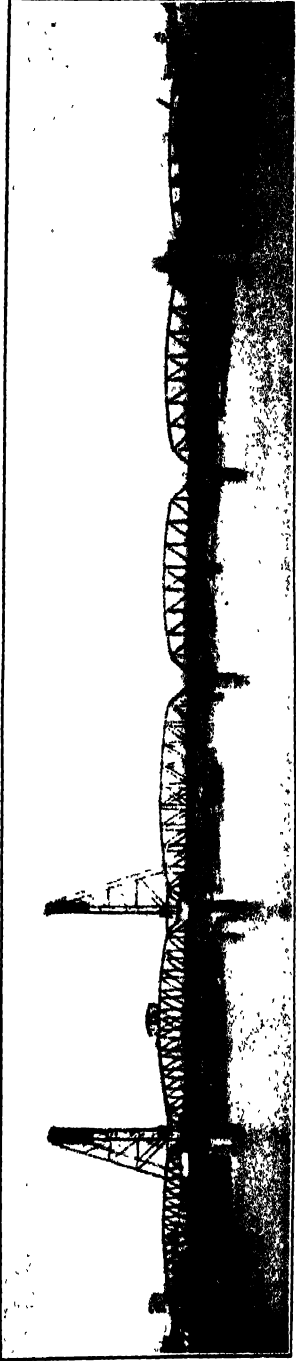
Hawthorne Avenue Bridge over the Willamette River at Portland, Ore.—Lifting Span Down.
